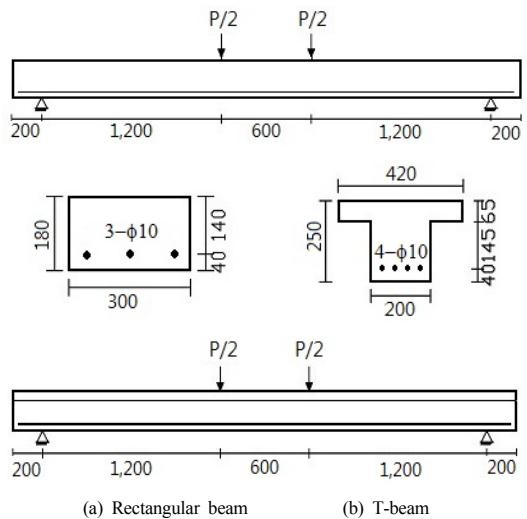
Concrete dimensions and reinforcing details for beam specimens
